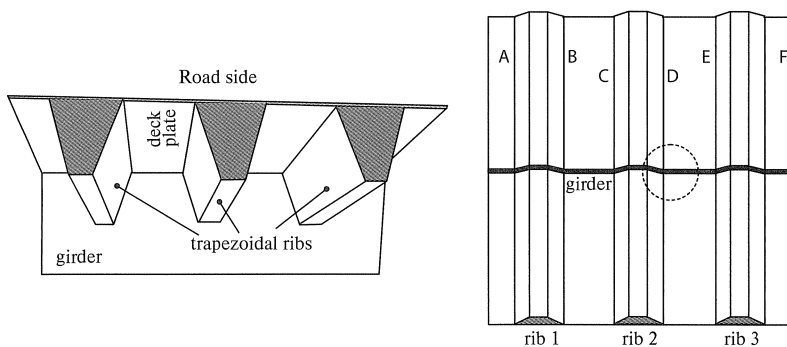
Left: Construction of a steel orthotropic bridge deck. Right: Bottom view on the bridge deck specimen and its rib welds.
